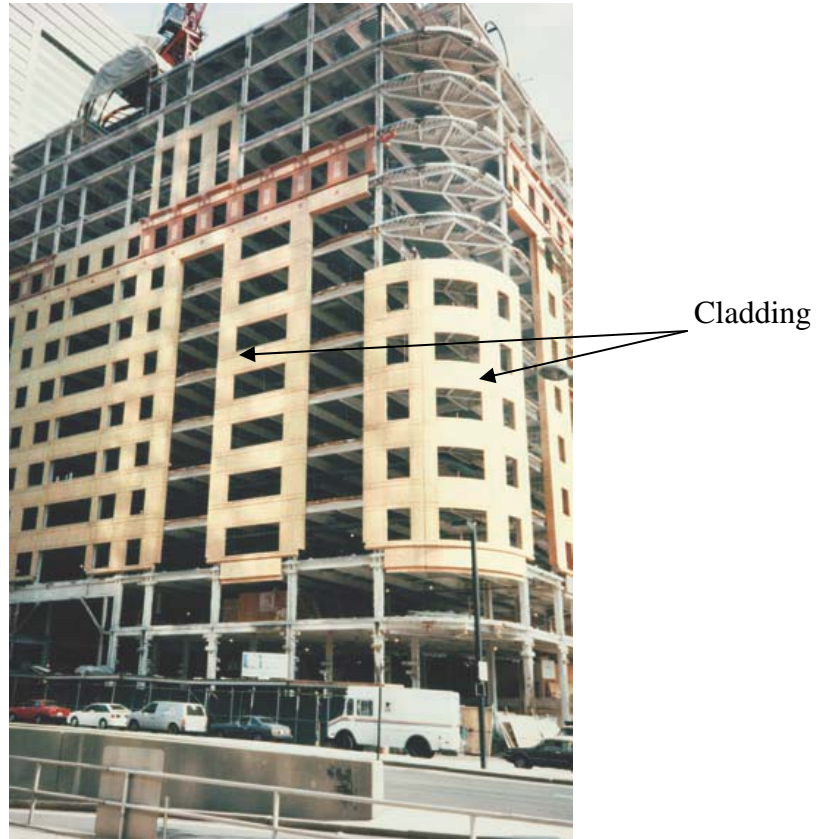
Building using cladding system (from Precast/Prestressed 2007, by permission).
